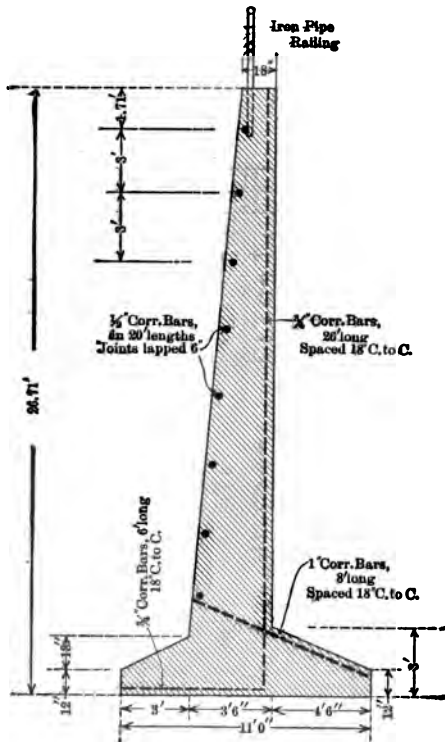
Section through the Dayton, O., Retaining Wall.
